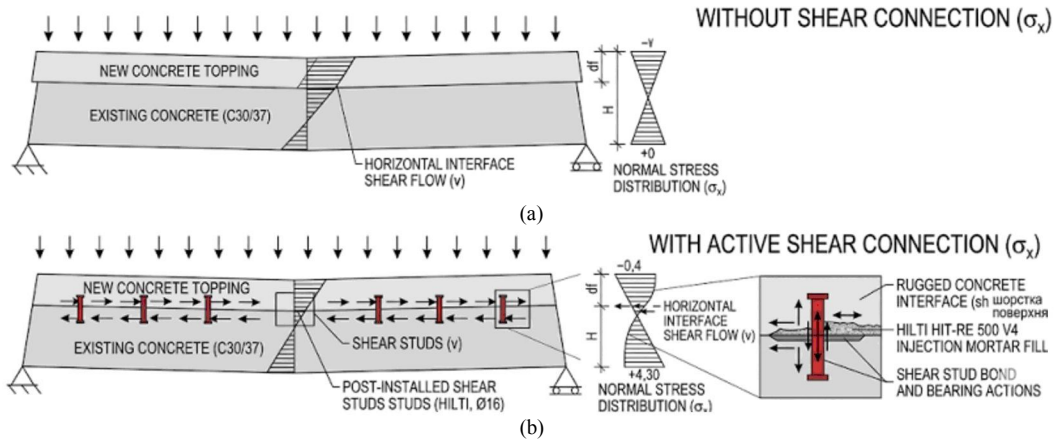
The stressed state of the beam: without shear connection; and with activation of shear connection
